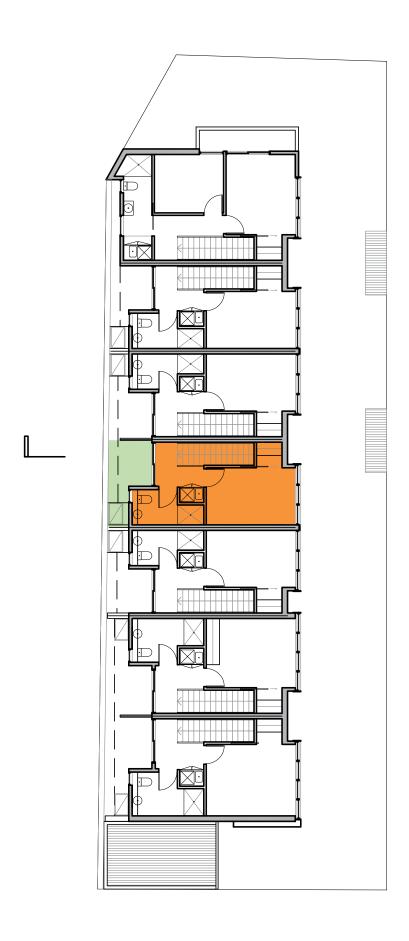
TOWNHOUSE FIRST FLOOR PLAN
